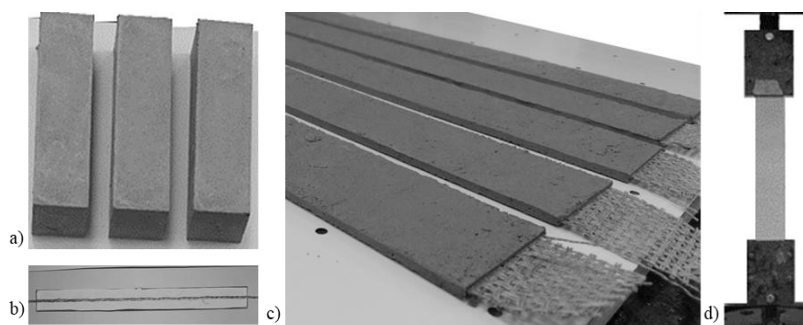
a) prismatic mortar specimens; b) textile specimen; c) TRM specimens; d) TRM coupon tensile test set up.
